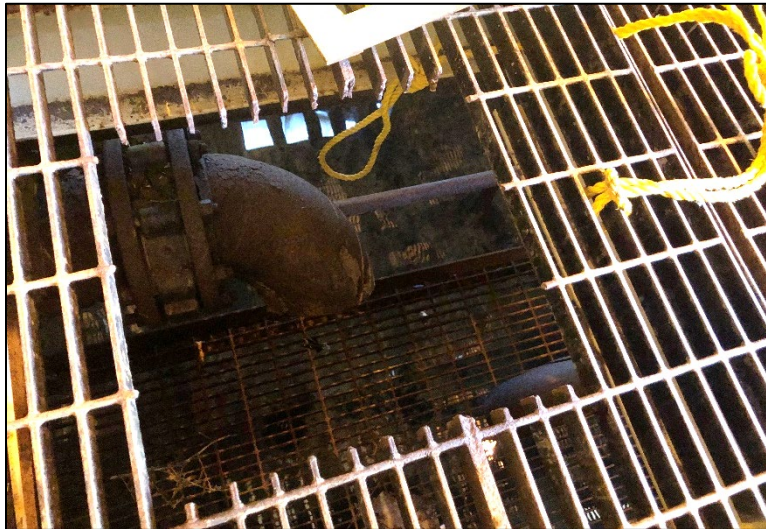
View inside VLF-1 underdrain shed, showing no flows from underdrain pipe #1 during inspection.
